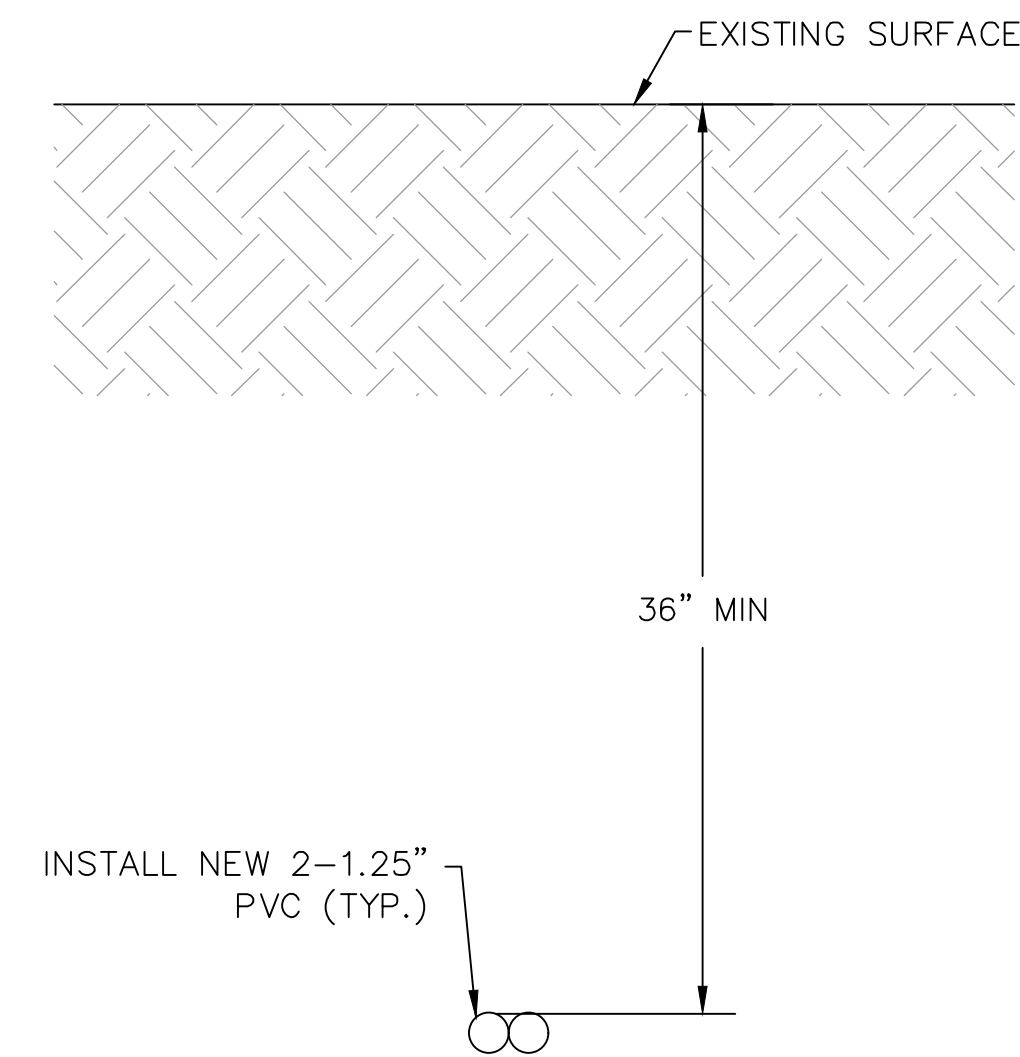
DETAIL B (FOR EXISTING CONDUIT WITH NEW FIBER)
